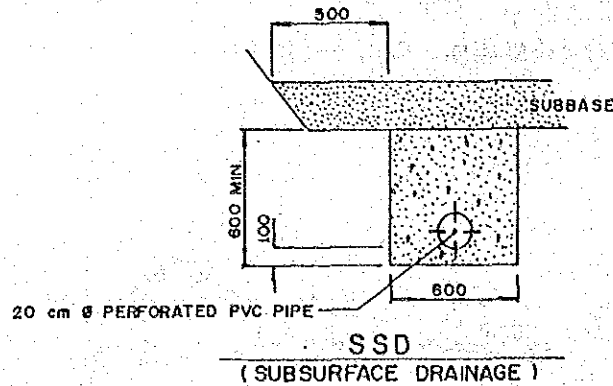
TYPICAL CROSS-SECTION OF SUBSURFACE DRAINAGE
